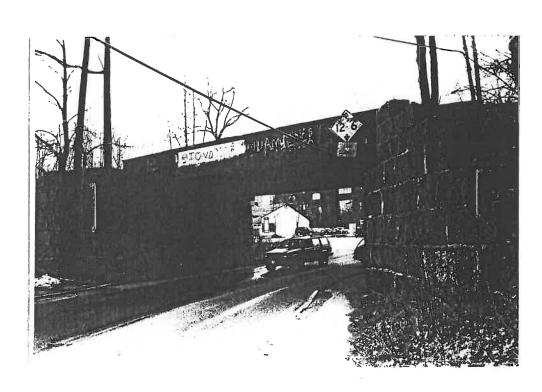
description: Thru Plate Girder Bridge over Bartlett Street, Portsmouth (56.19) Direction:
